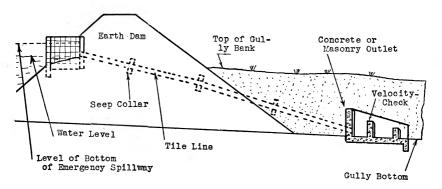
Cross-section view through dam showing tile entrance, tile line, and outlet baffles.
